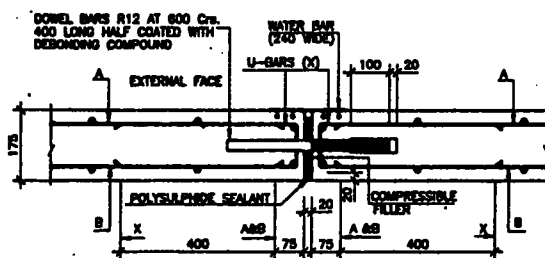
WATER BAR AT BASE SLAB/WALL JOINT.
